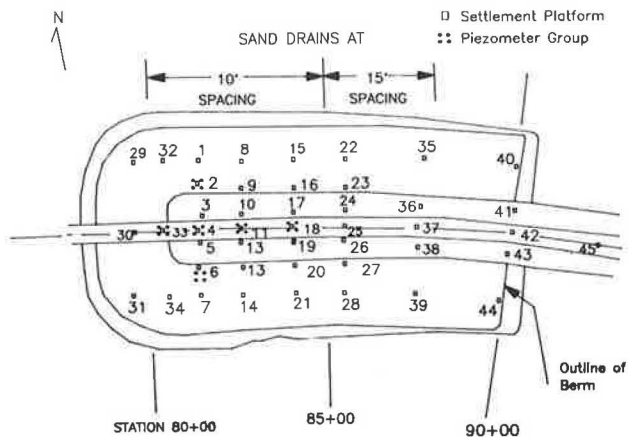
Layout of instrumentation at the area with vertical drains at Putnam Bridge (note location of SP-11 piezometer group).
